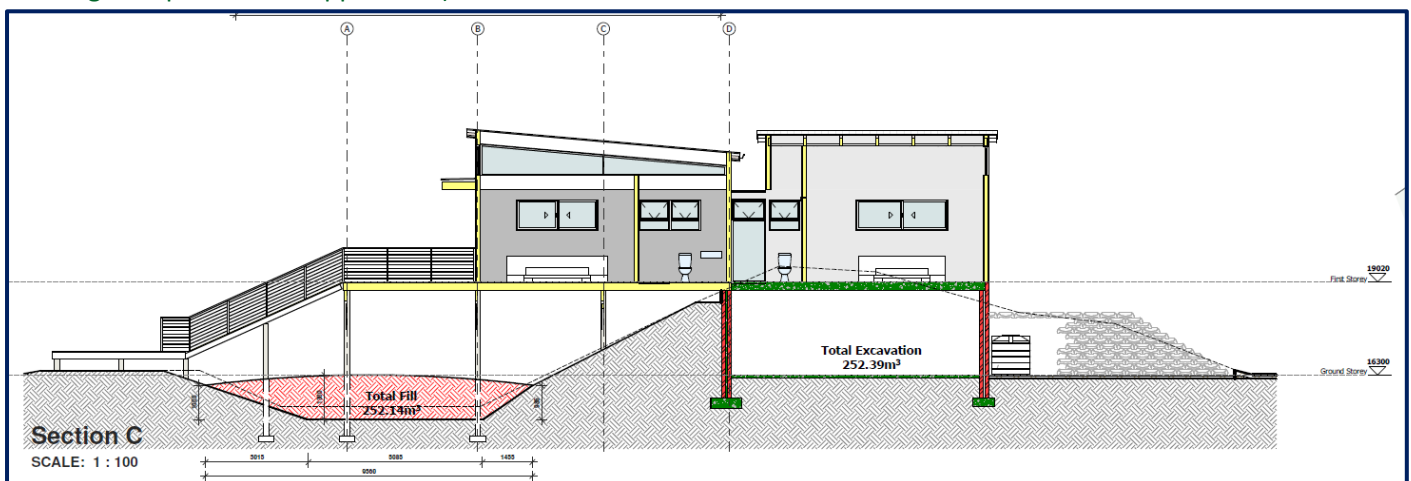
Design of the proposed dwelling on Erf 1363 (adapted from Pure Design, June 2026) (Refer to Appendix A1)
